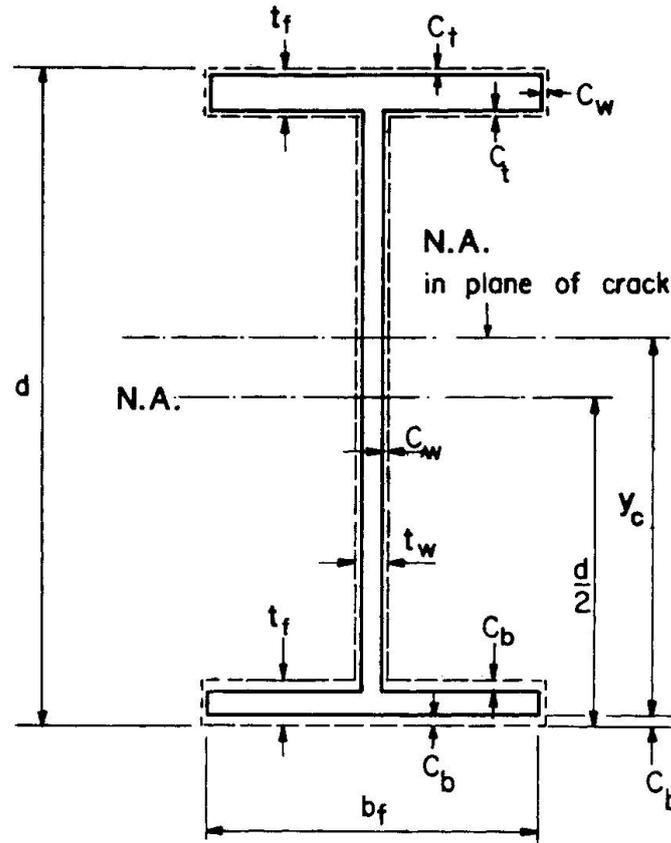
Wide Flange Beam with Noncorroded and Corroded Sections
